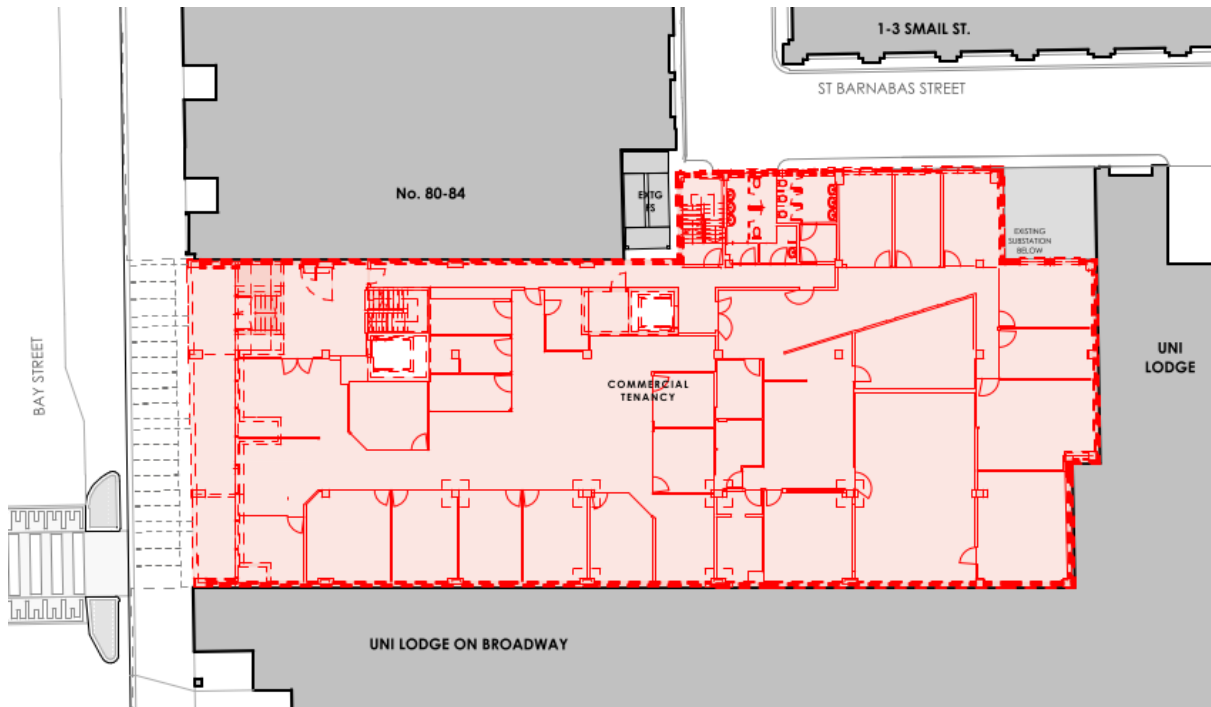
Ground level demolition plan (all site structures proposed to be demolished)
